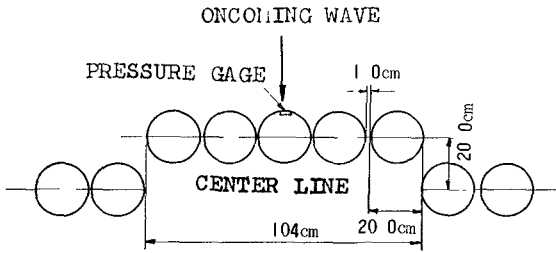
Plan of the steel-pipe breakwater reconstructed after destruction.
